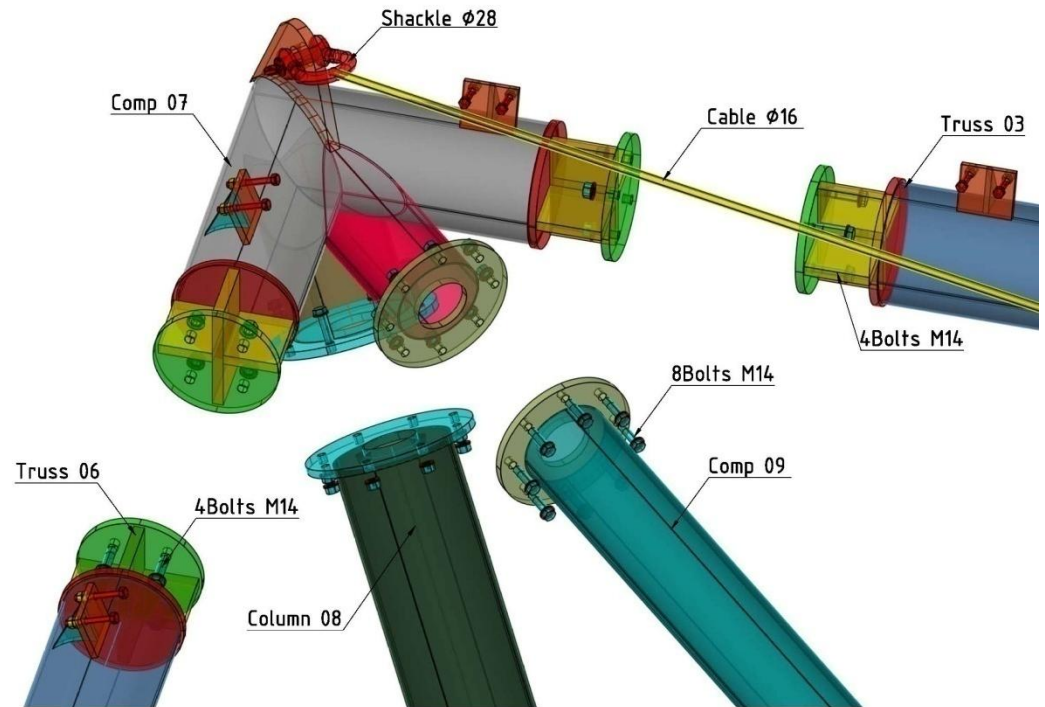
The above image shows a corner detail in north west part of structure, Comp 07 connects 4 other components (comp 08,09 and truss 03,04) to each other with flanges.
